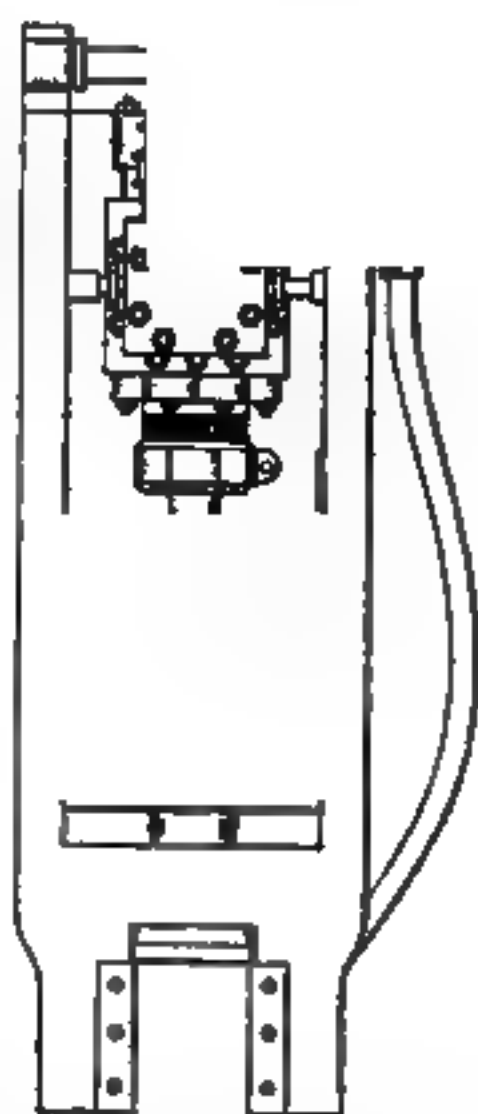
Large-size Power-hammer for Driving Sheet-piling Planks
